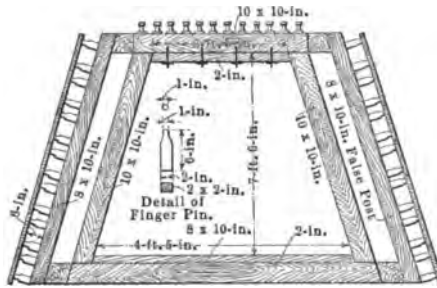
BRIDGE SETS WITH LAGGING OVER FINGER PINS.
